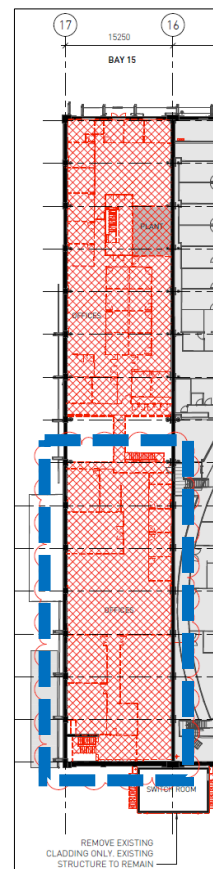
Proposed Fabric Removal Plan – Mezzanine Level (Source: Sissons, 2020)
